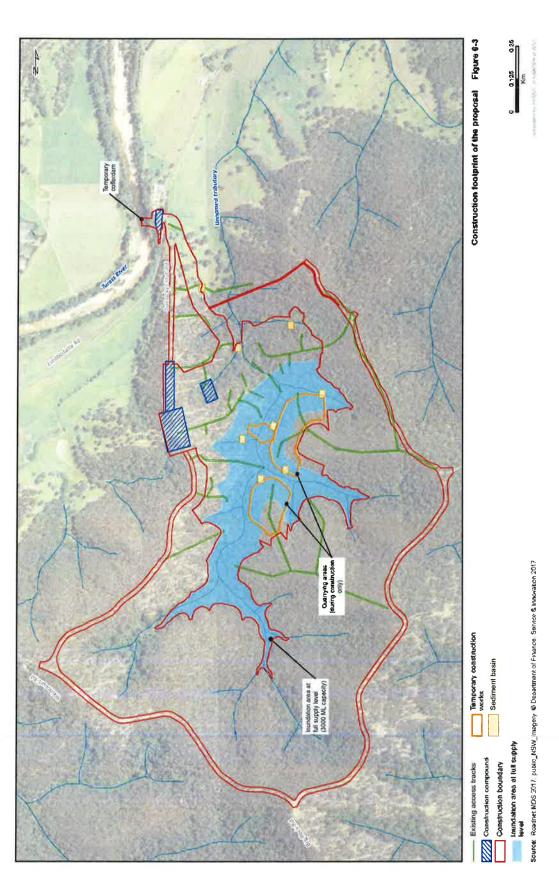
Water Storage Facility and Perimeter Road Construction Boundaries
